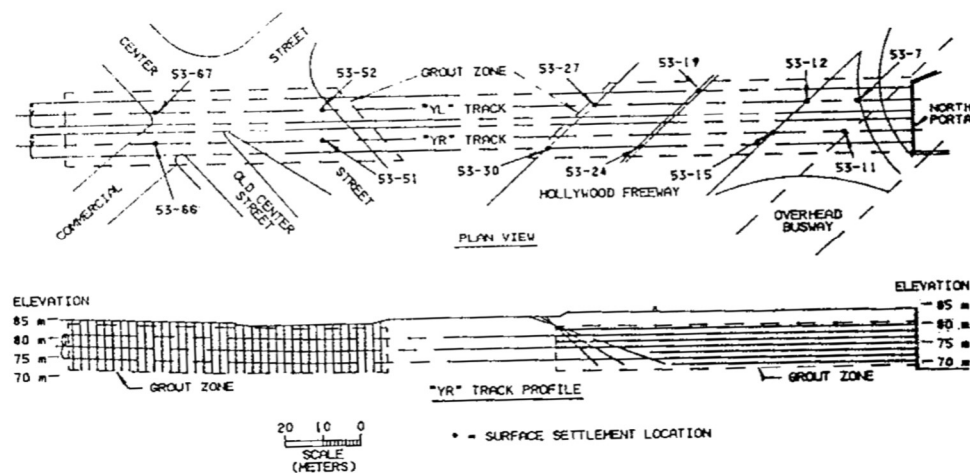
Tunnel alignment and extent of grouting (Gularte et al. 1992)
